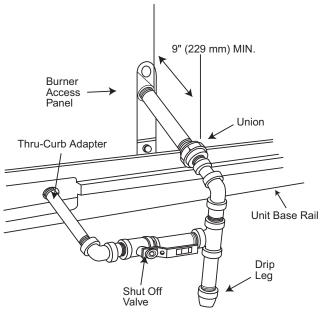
Gas Piping with Thru-Curb Accessory (Alternate Layout)
